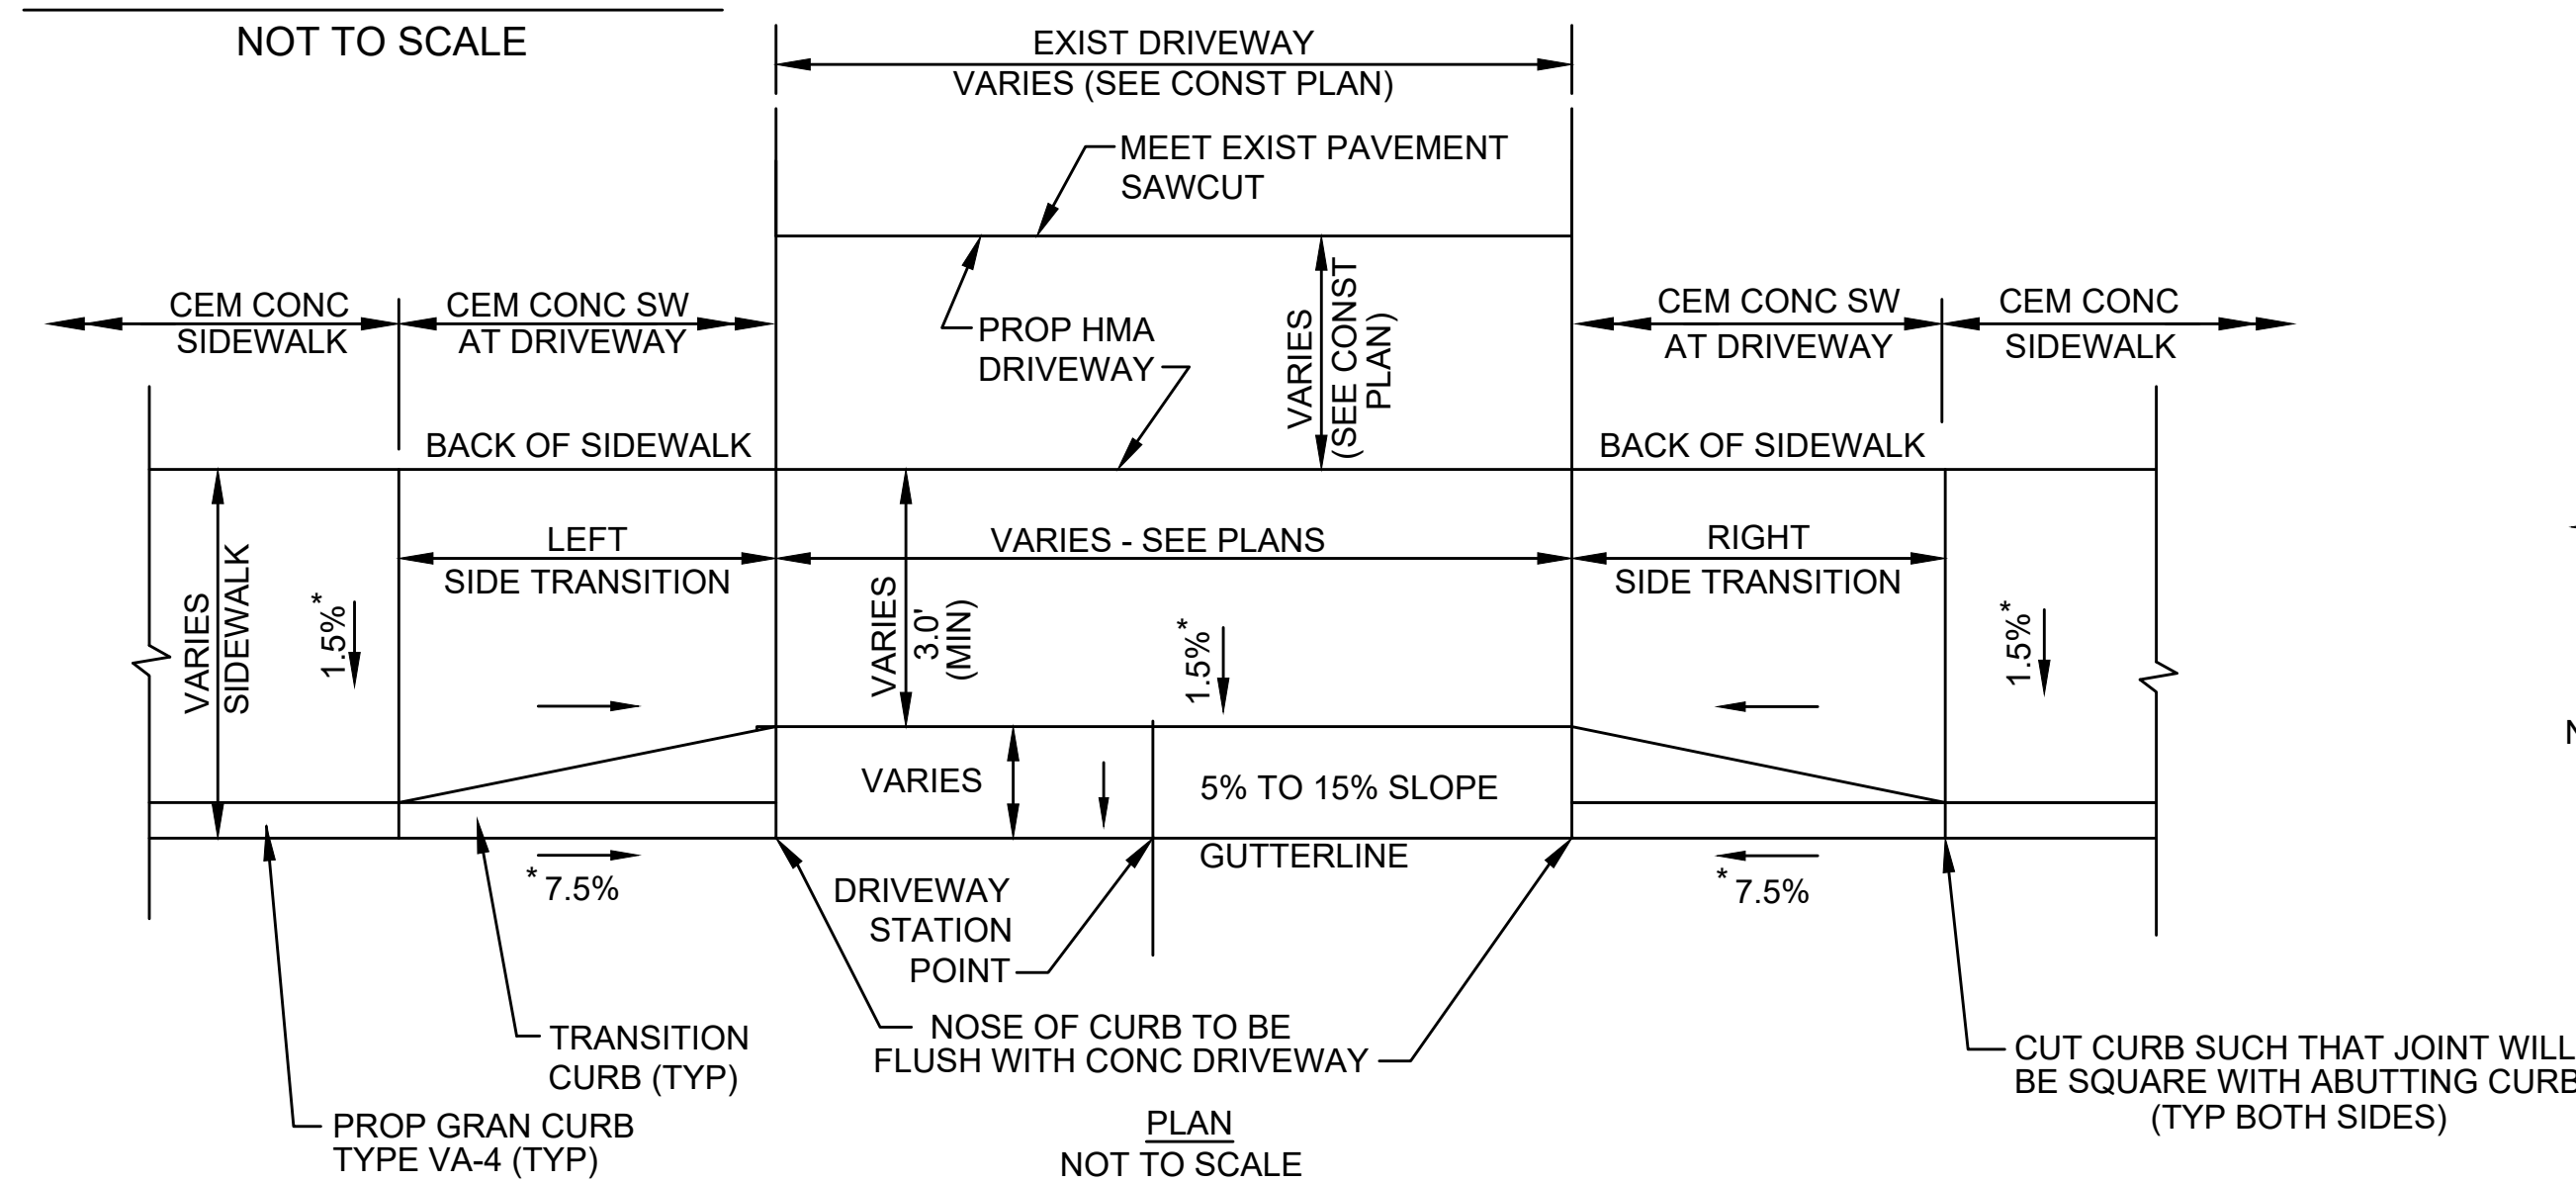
DETAIL FOR GRANITE CURB AT BACK OF SIDEWALK
